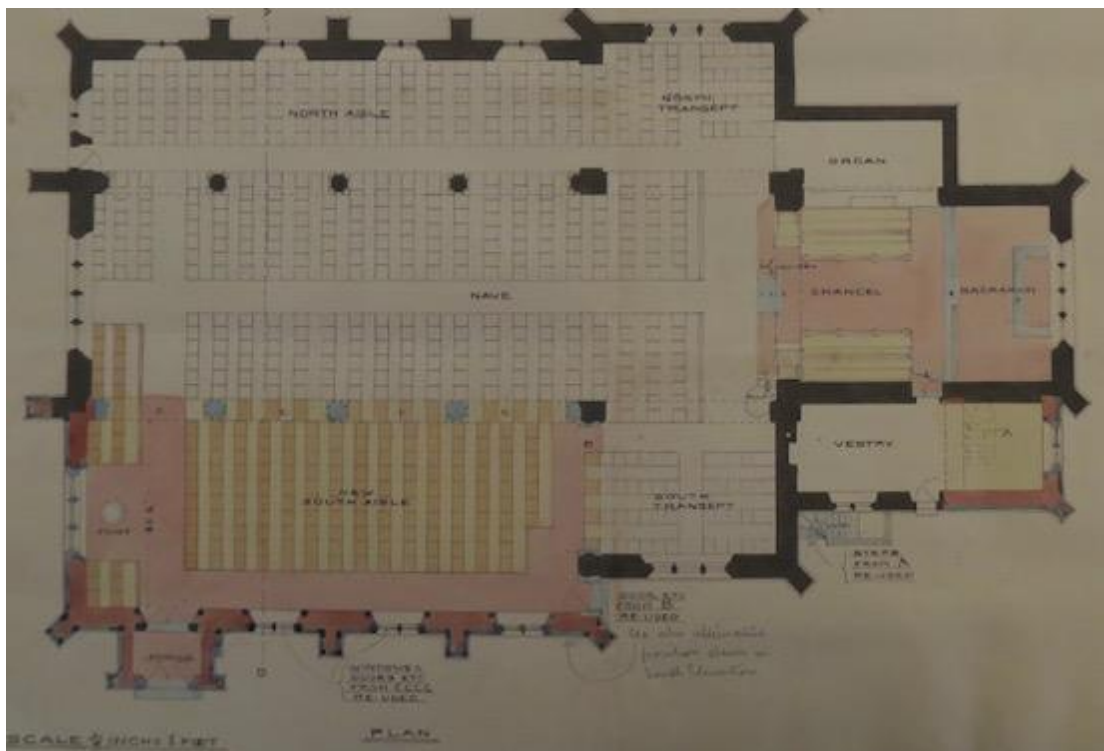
Church as it exists today. This plan from 1910 shows the addition of the south aisle.
